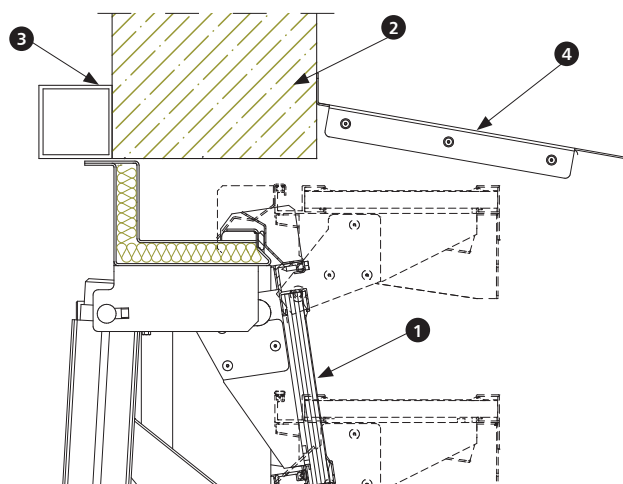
Installation of louvered vent on a sheet-covered system roof
